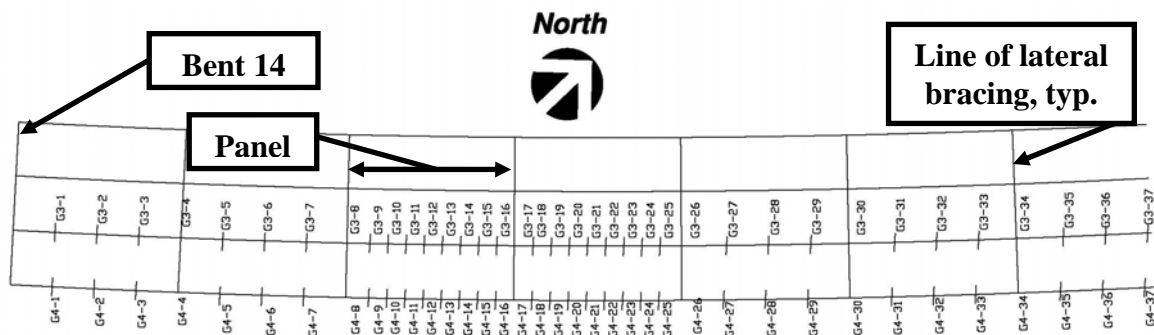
Web Imperfection Plan at SH 71-SH 130 (Span 14)
